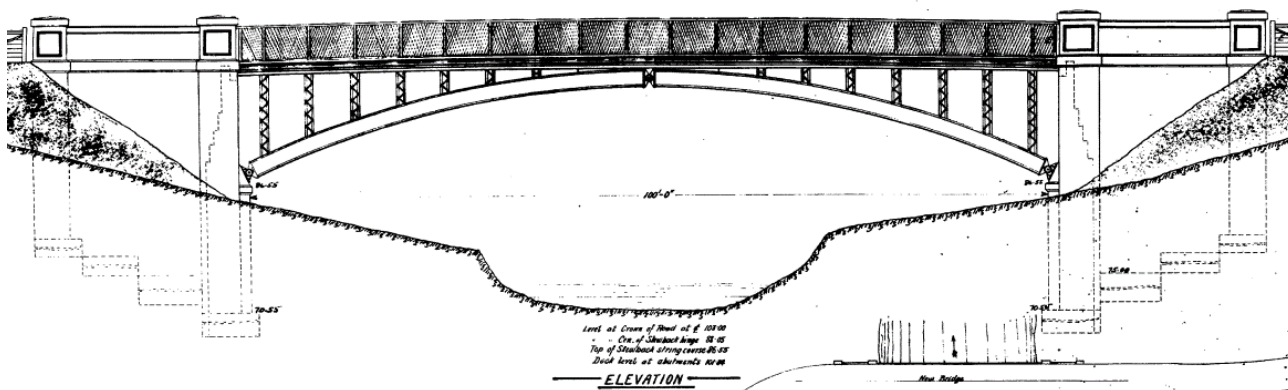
Bridge Elevation as Shown in 1913 Drawings
